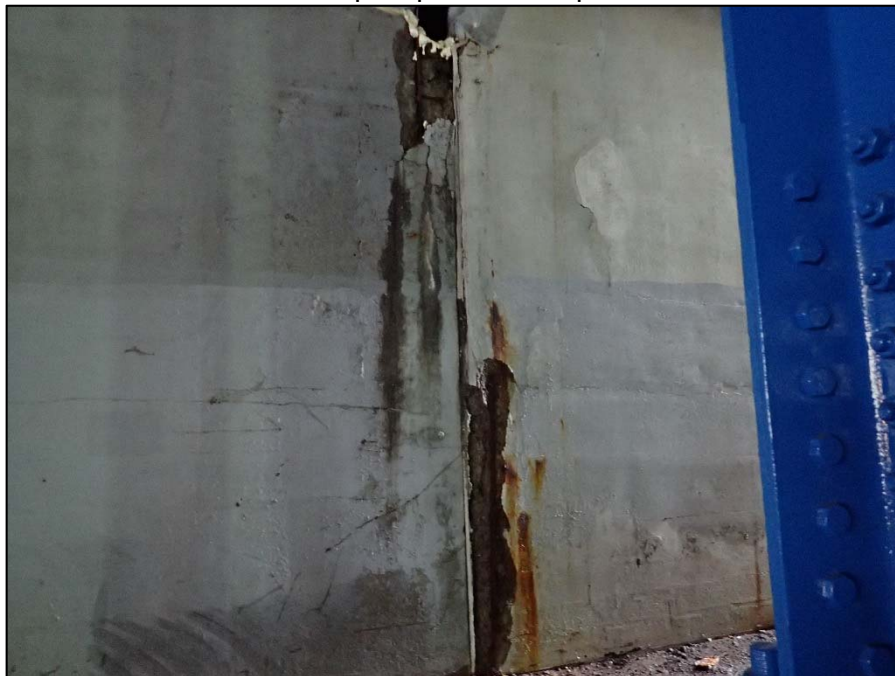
Unit IV, West Lakeside exit ramp; South wall exhibits spalling with exposed reinforcement and delaminations
